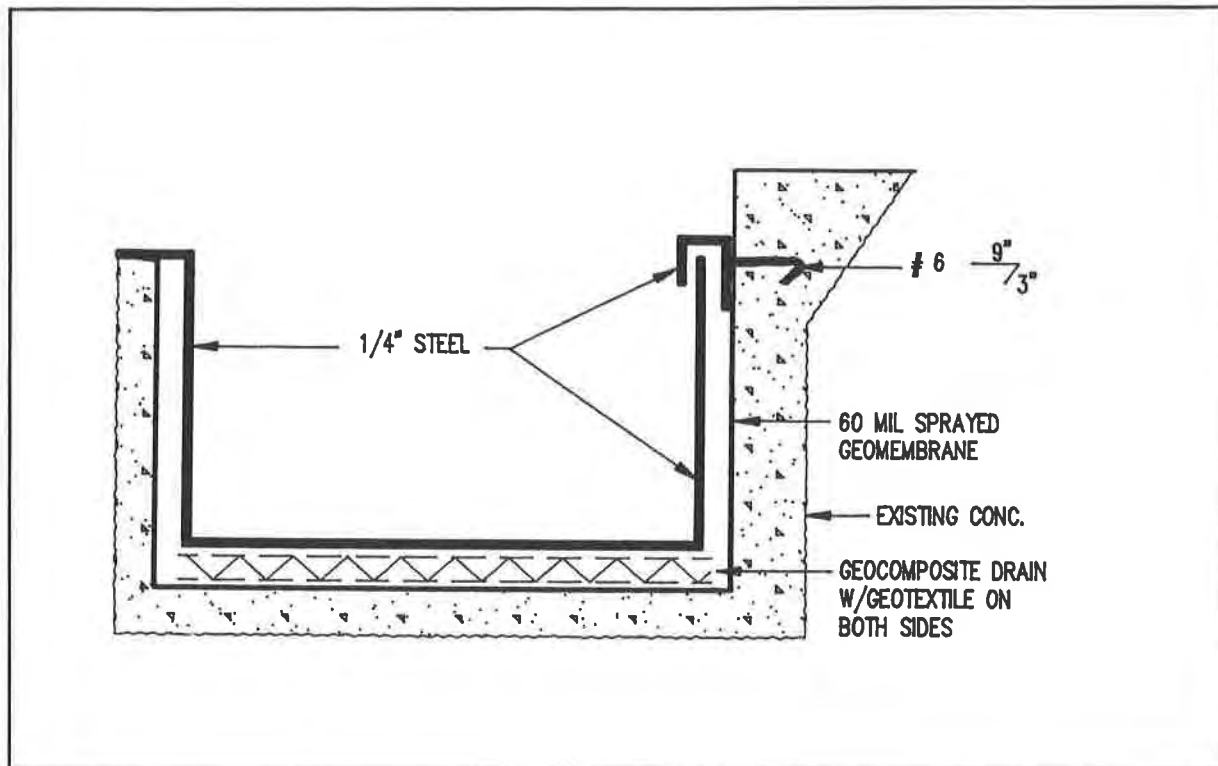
DETAIL OF STEEL PAN ON EXISTING PAVEMENT CONTAINMENT SYSTEM
